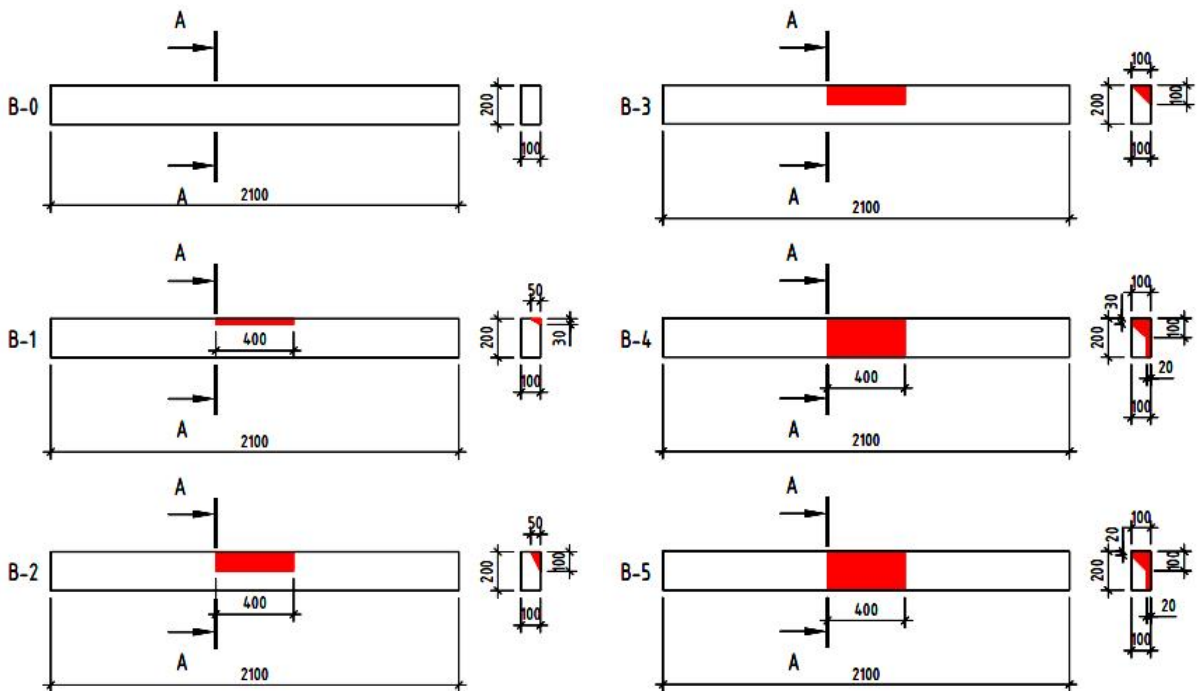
Damage scheme of reinforced concrete beams under investigation
